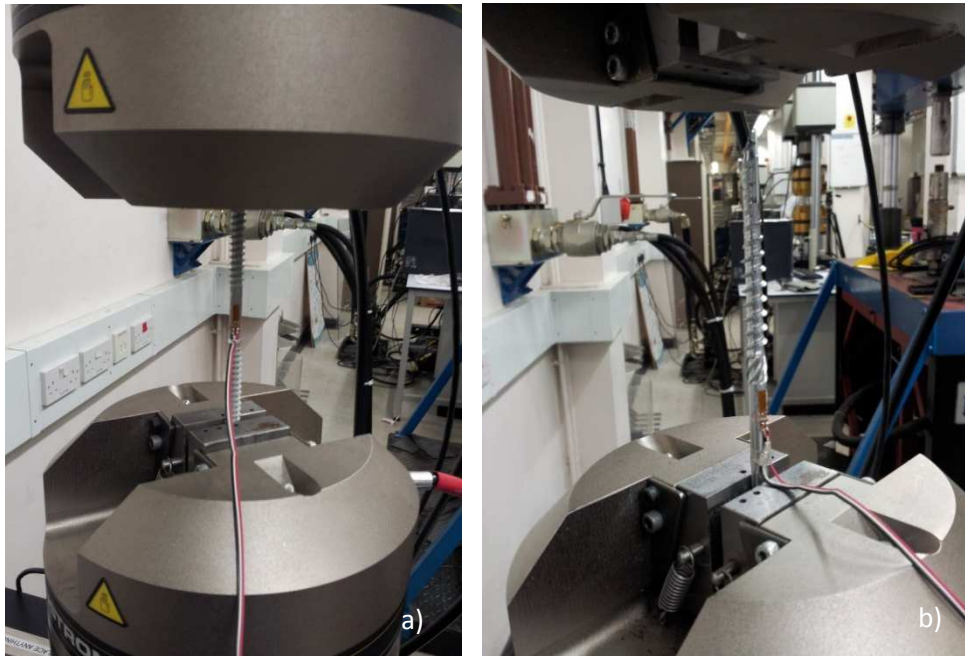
Tensile tests on the connectors – a) double thread screw; b) single thread screw
